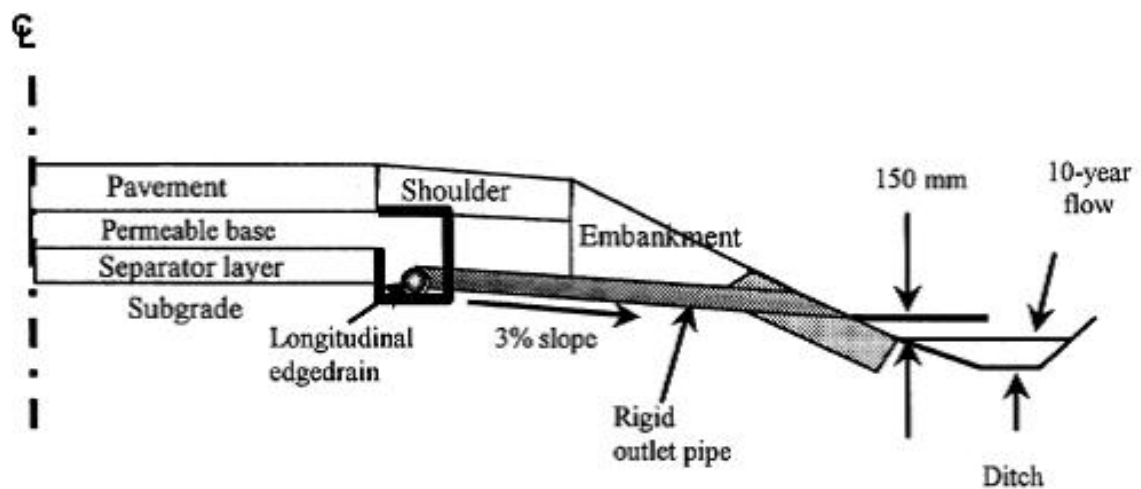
Typical Drainage Systems of Modern Pavements (With Logitudinal Edgedrain and Outlet Pipe)
